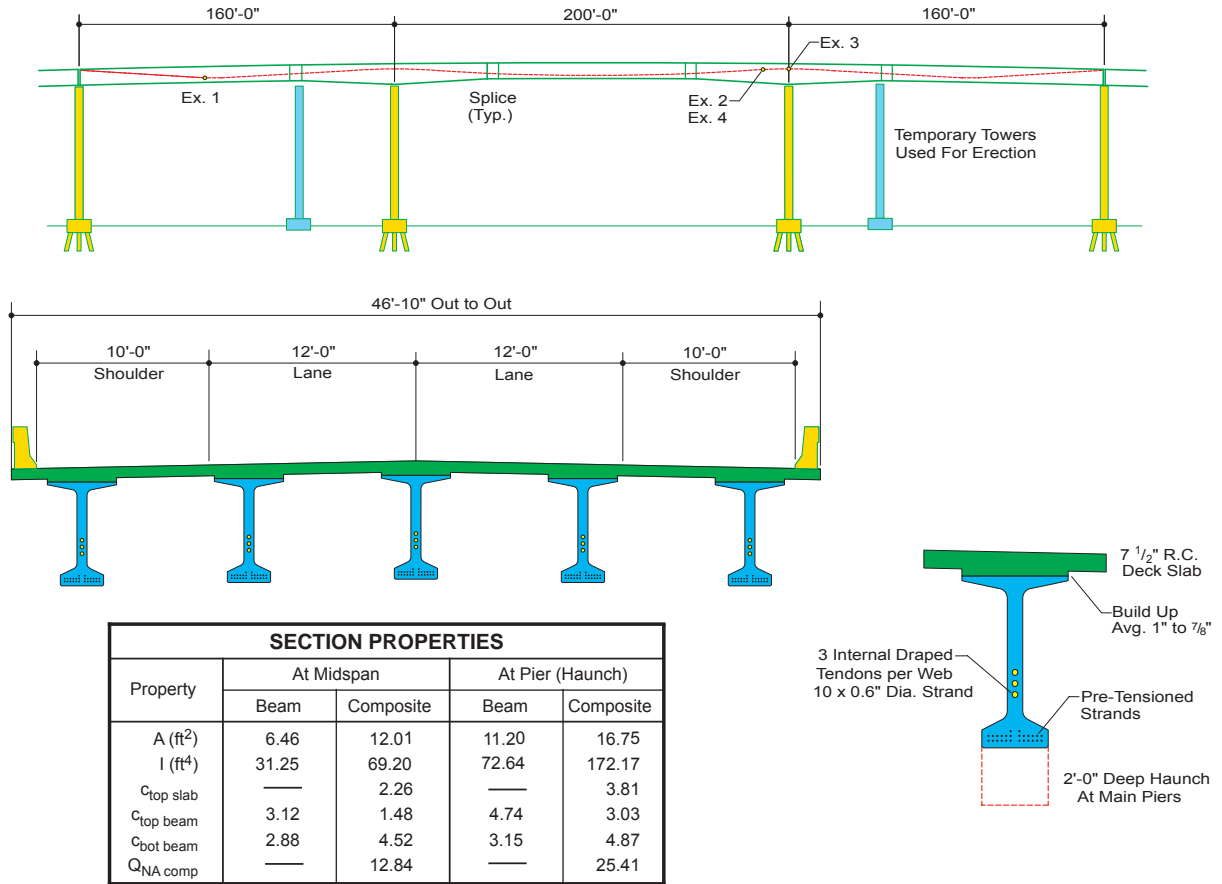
Continuous Three Span Main Channel Unit - Haunched Bulb-Tee Girder Bridge
